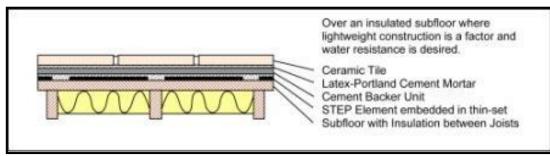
Installing Underfloor Heating Under Stone and Ceramic Tile (http://www.electricunderfloorheatingsystems.com/install-heated-floors/under-tile.html)
